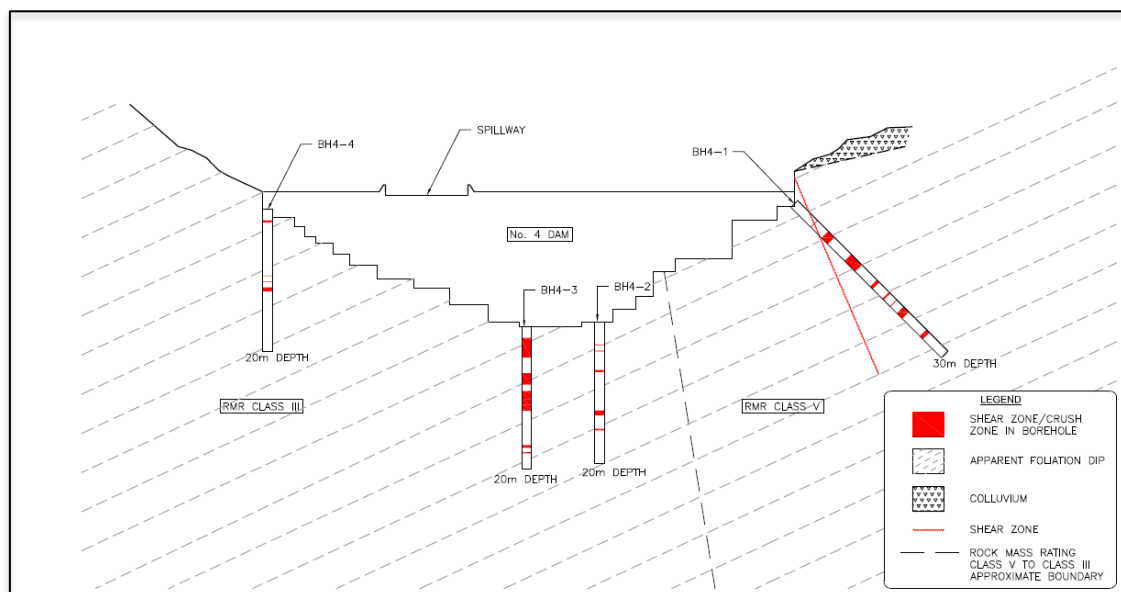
Cross Section of No.4 Dam showing encountered shear/crush zones.
